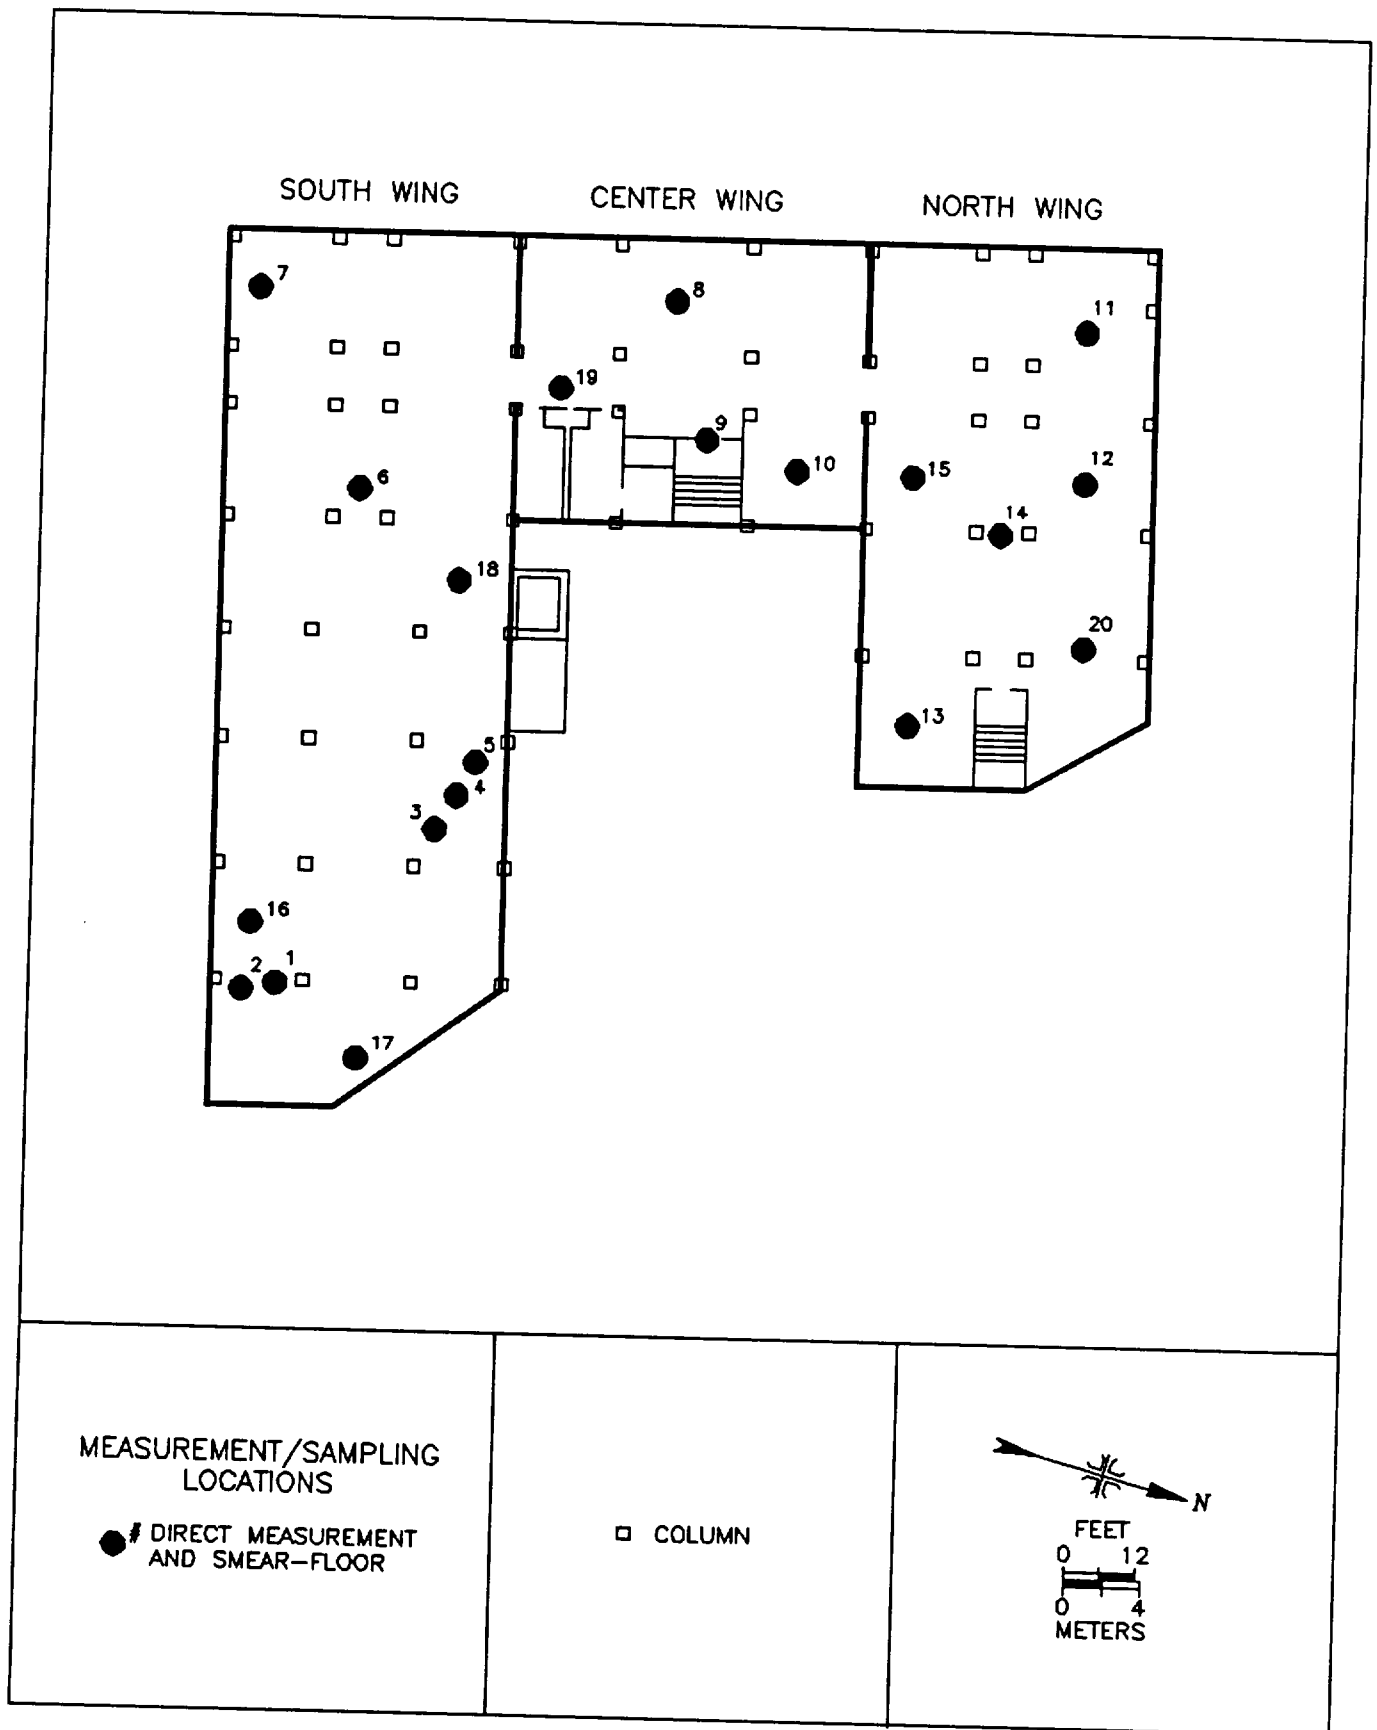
Building 7, Third Floor – Measurement and Sampling Locations
